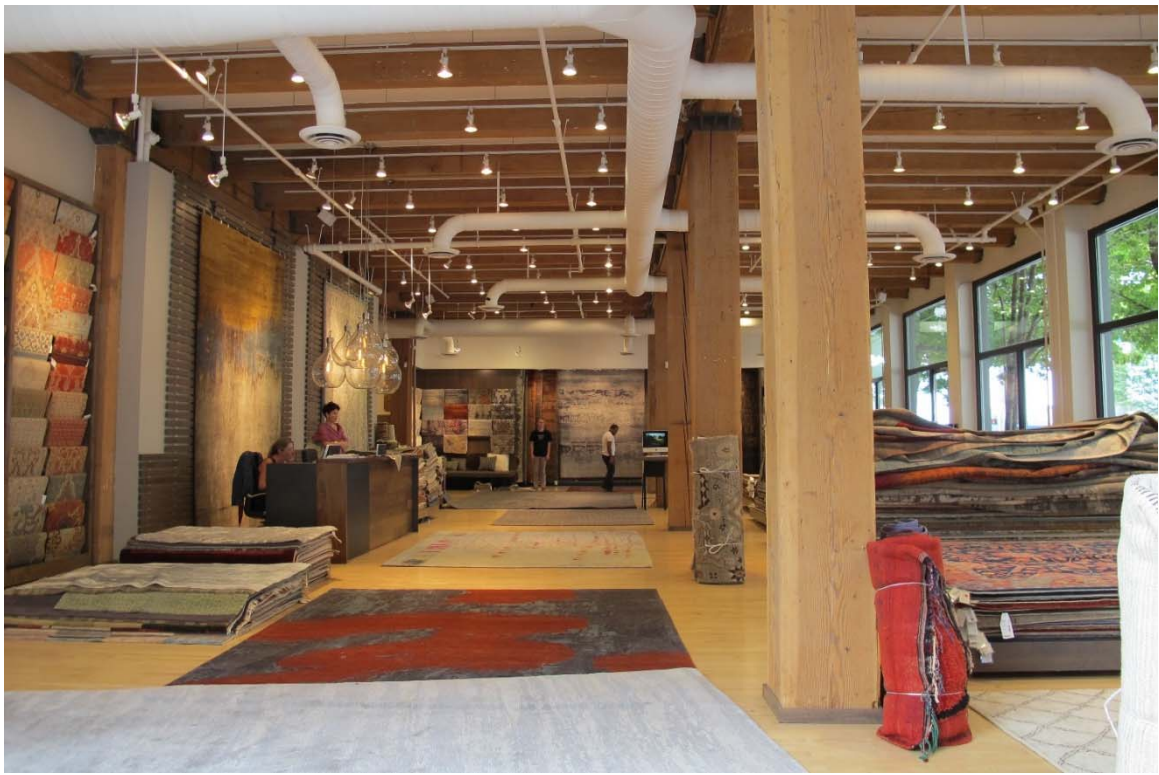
Interior, ground level retail space at northeast building corner, showing heavy timber piers.
